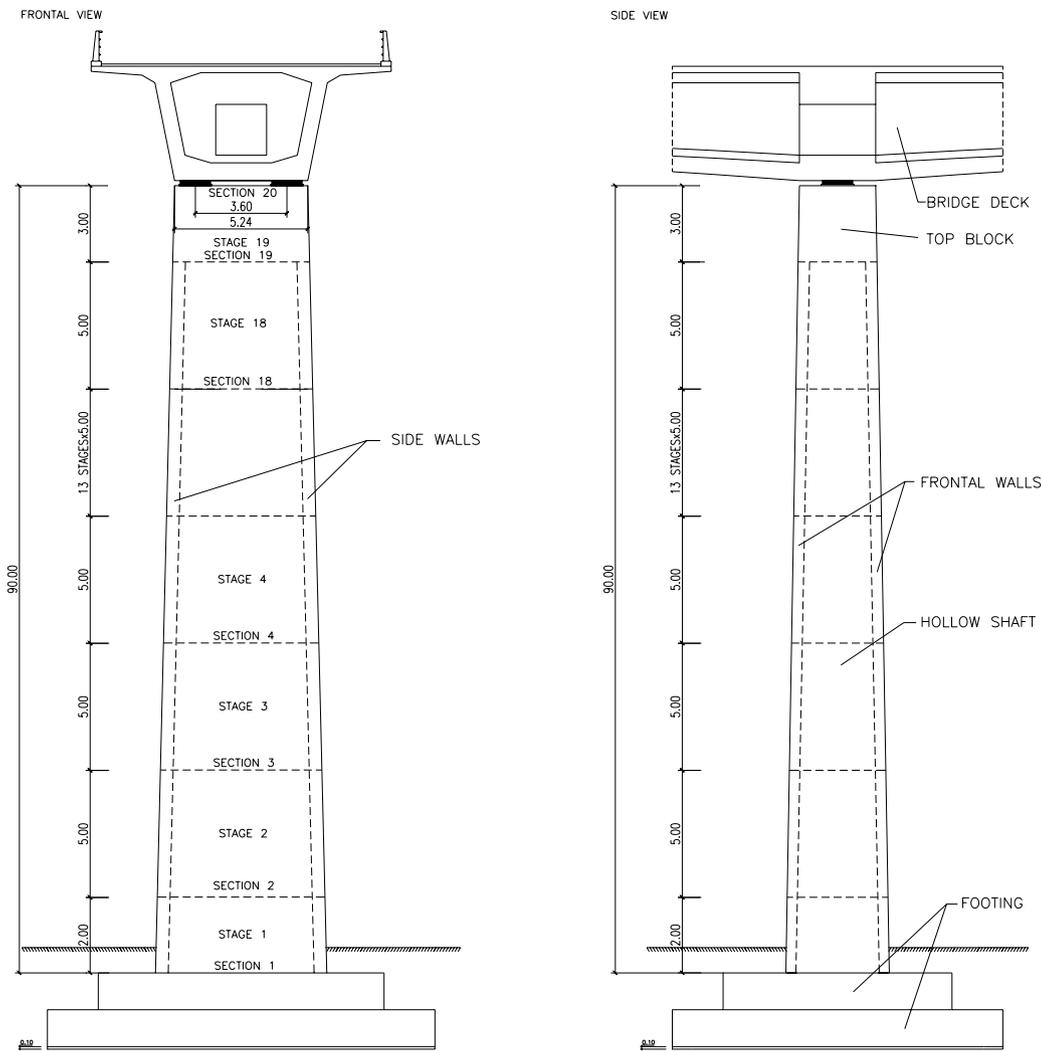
Typical frontal and side elevations of a tall bridge pier.
